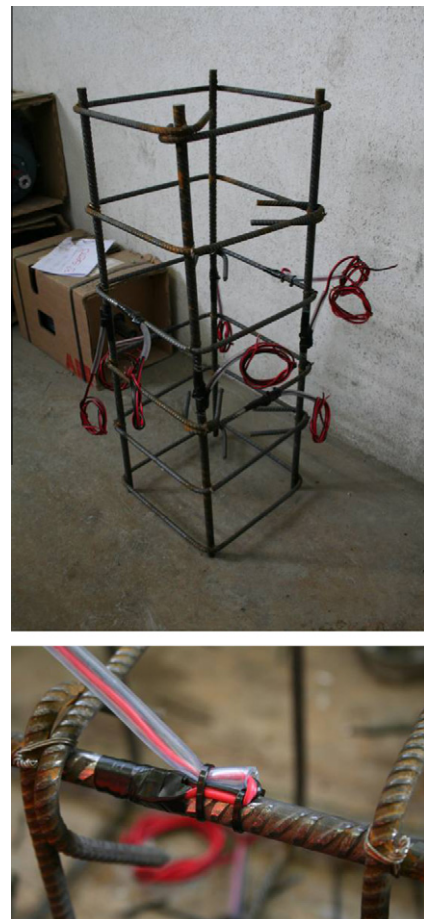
Strain-gauges on stirrups and longitudinal reinforcement bars.
